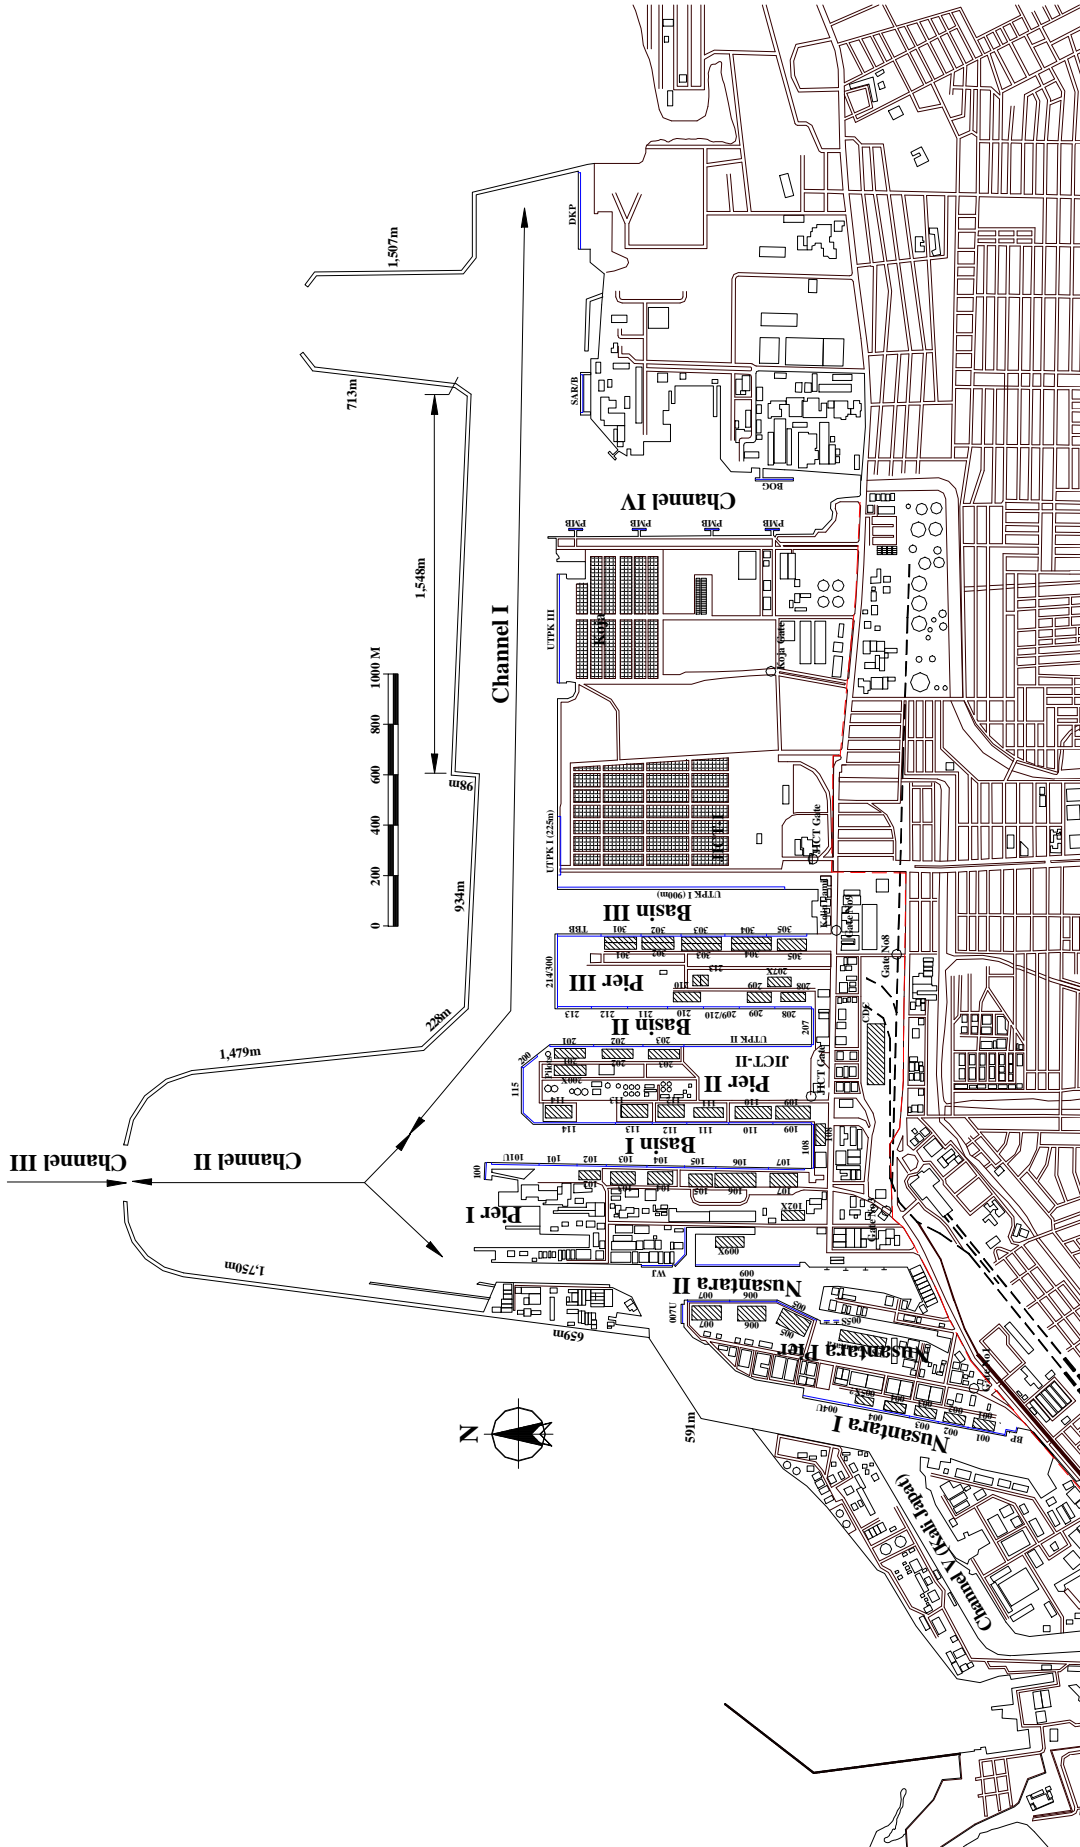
D-1 Layout of the Facilities of Tanjung Priok
